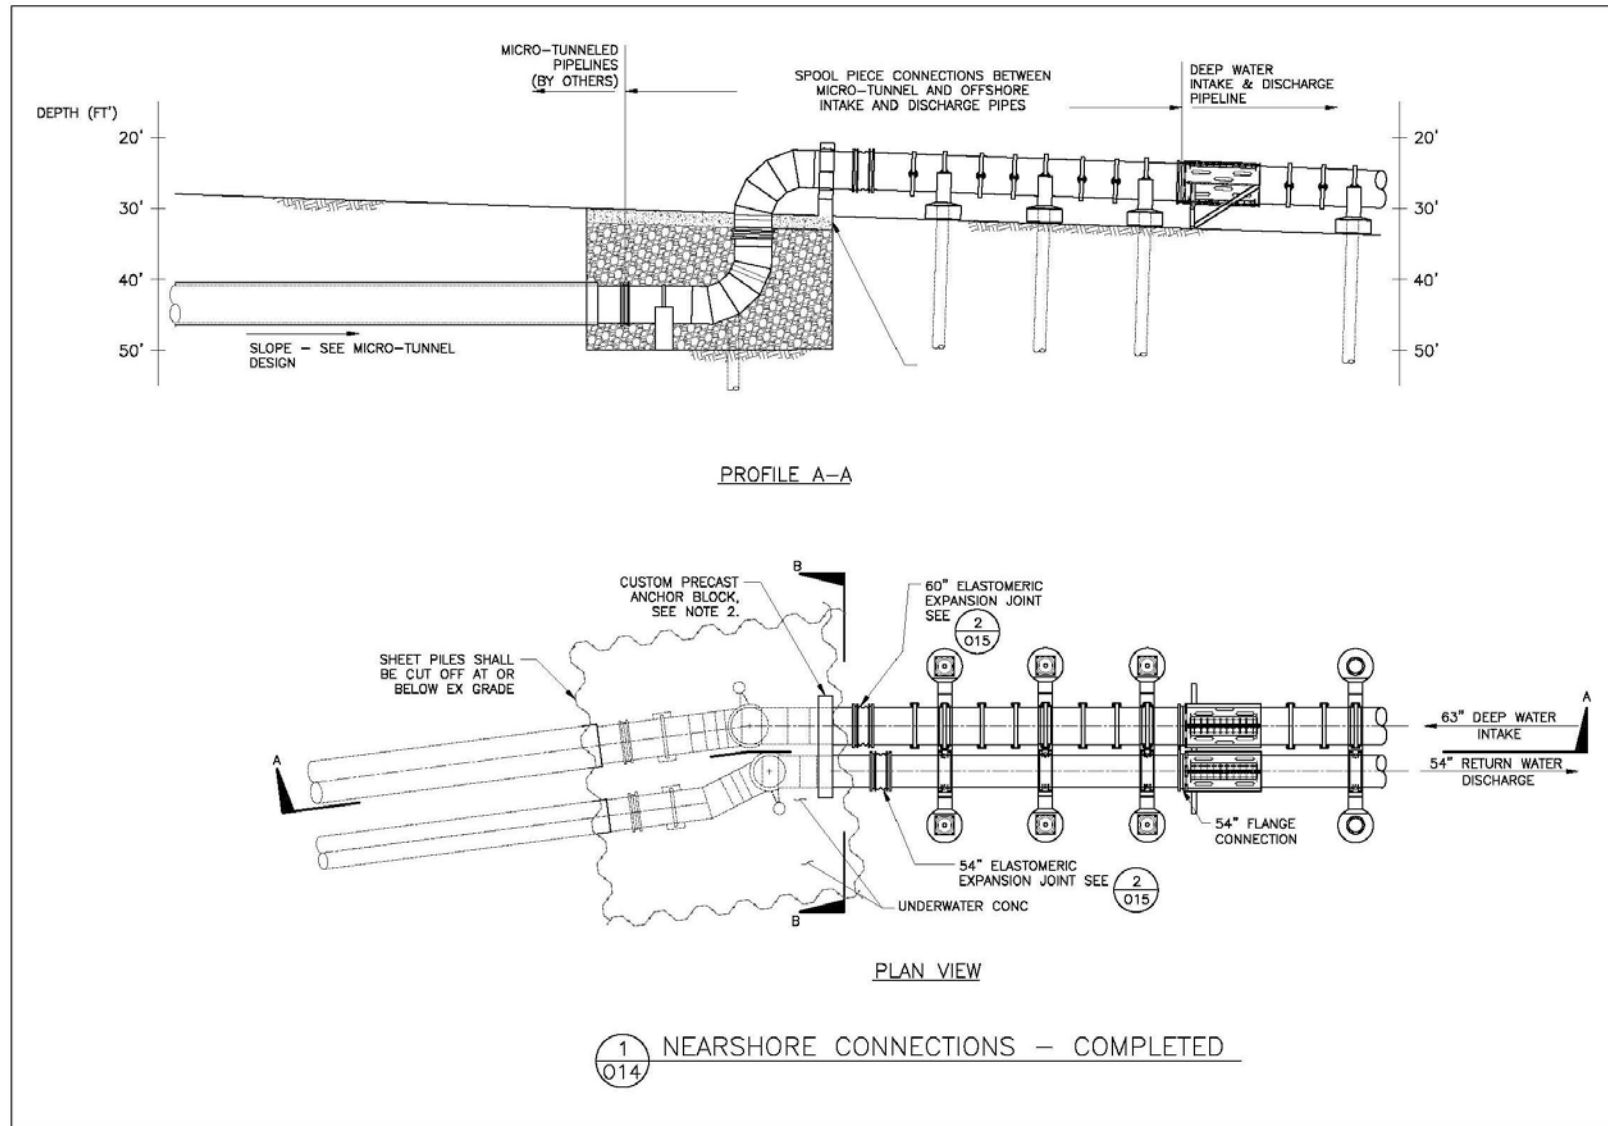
Details of Connection Between Microtunneled and Surface-mounted Segments of Seawater Pipes
